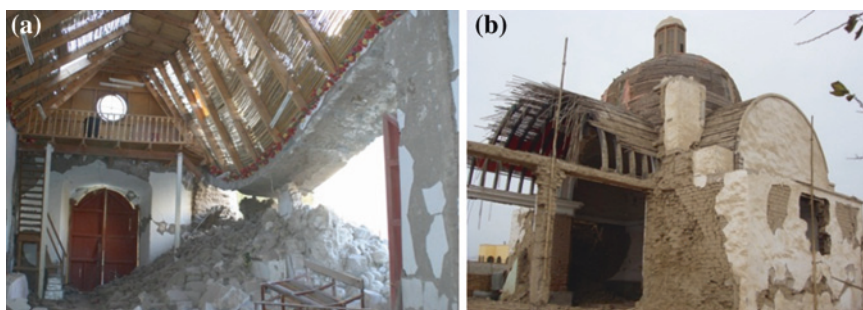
Examples of collapses after reinforcement using concrete. a Tarapacá Cathedral, Chile, 2005 (courtesy: Chesta J.). b San Luis de Cañete Church, Peru, 2007 [81]
